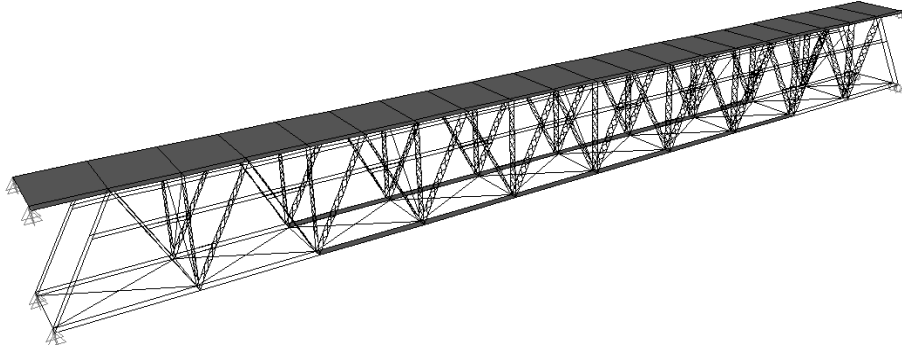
As built Analytical model of 47.50 m deck type steel truss bridge
